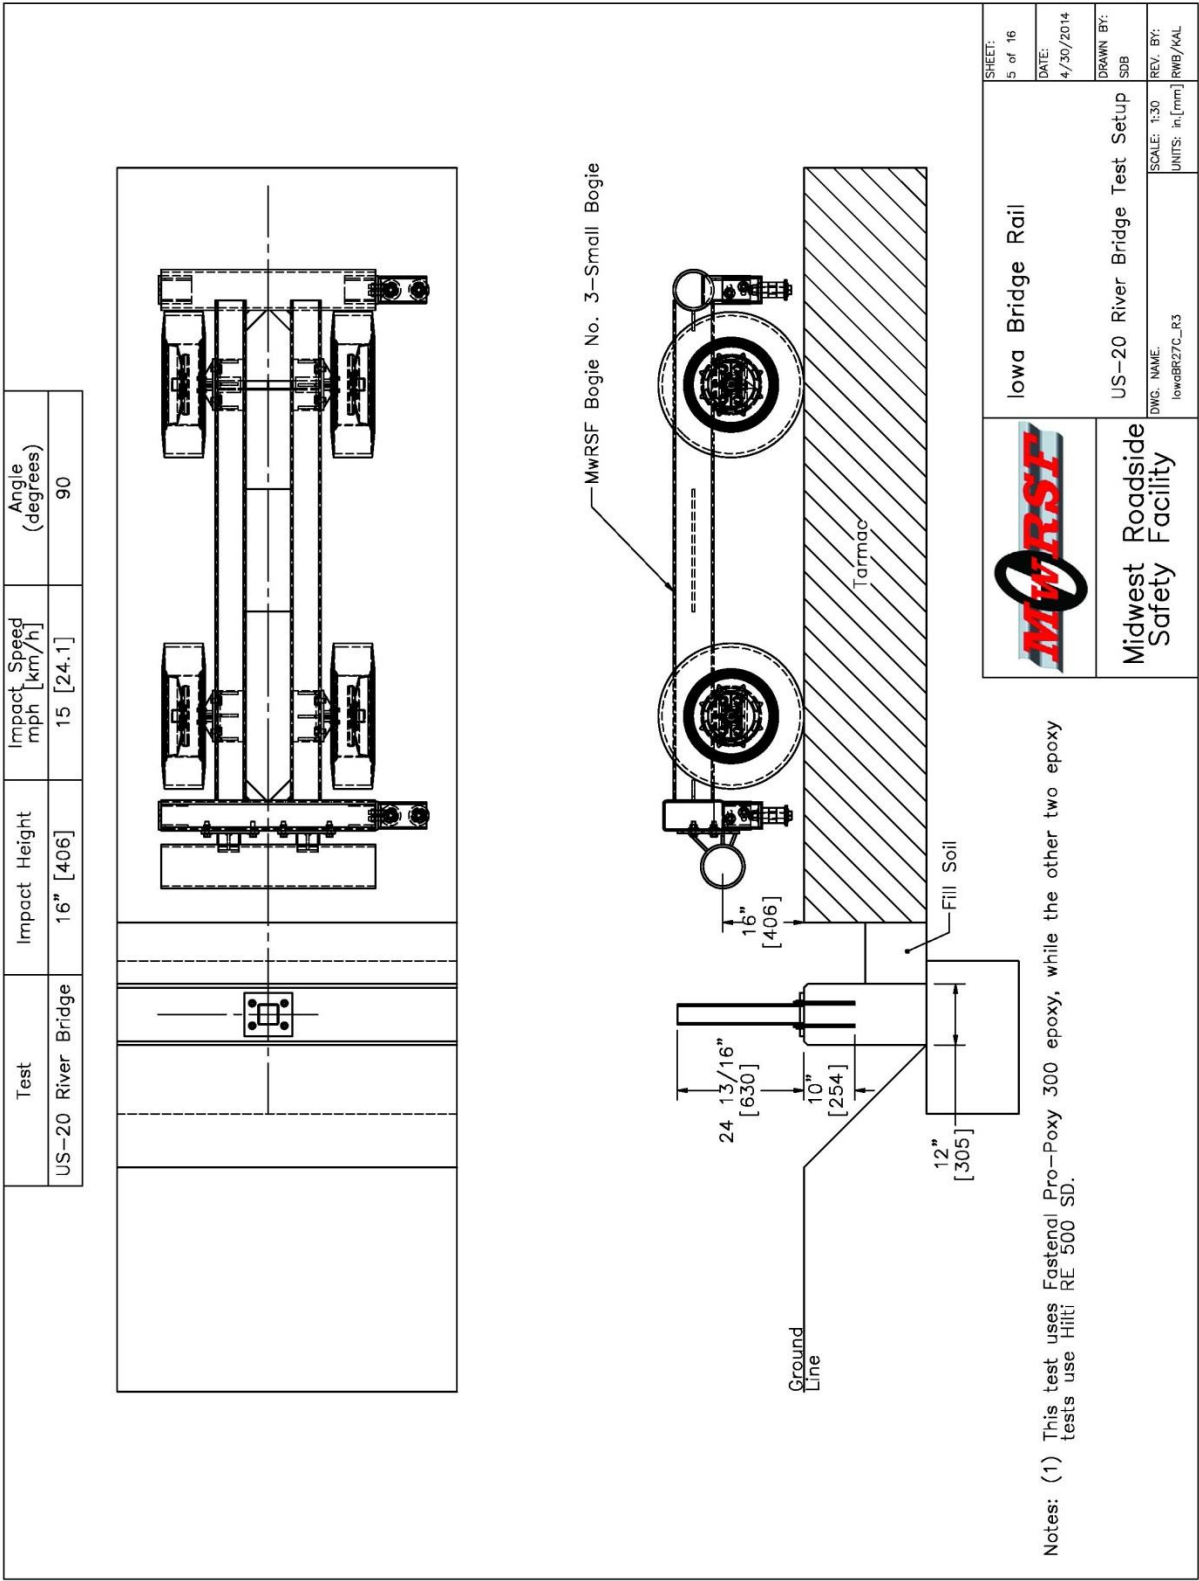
US-20 River Bridge Test Setup, Test No. IBP-4
